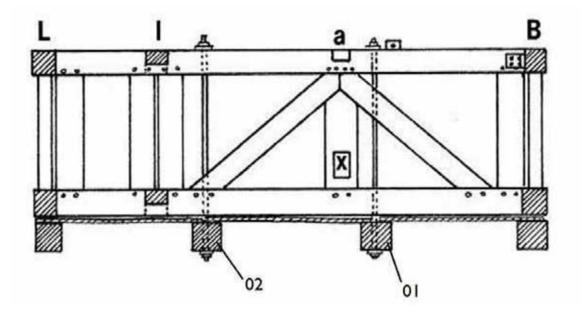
Drawing of one of the cross frames of bellframe showing its form, and also the foundation beams sampled for dendrochronology, adapted from original drawings by Pickford (2013)
